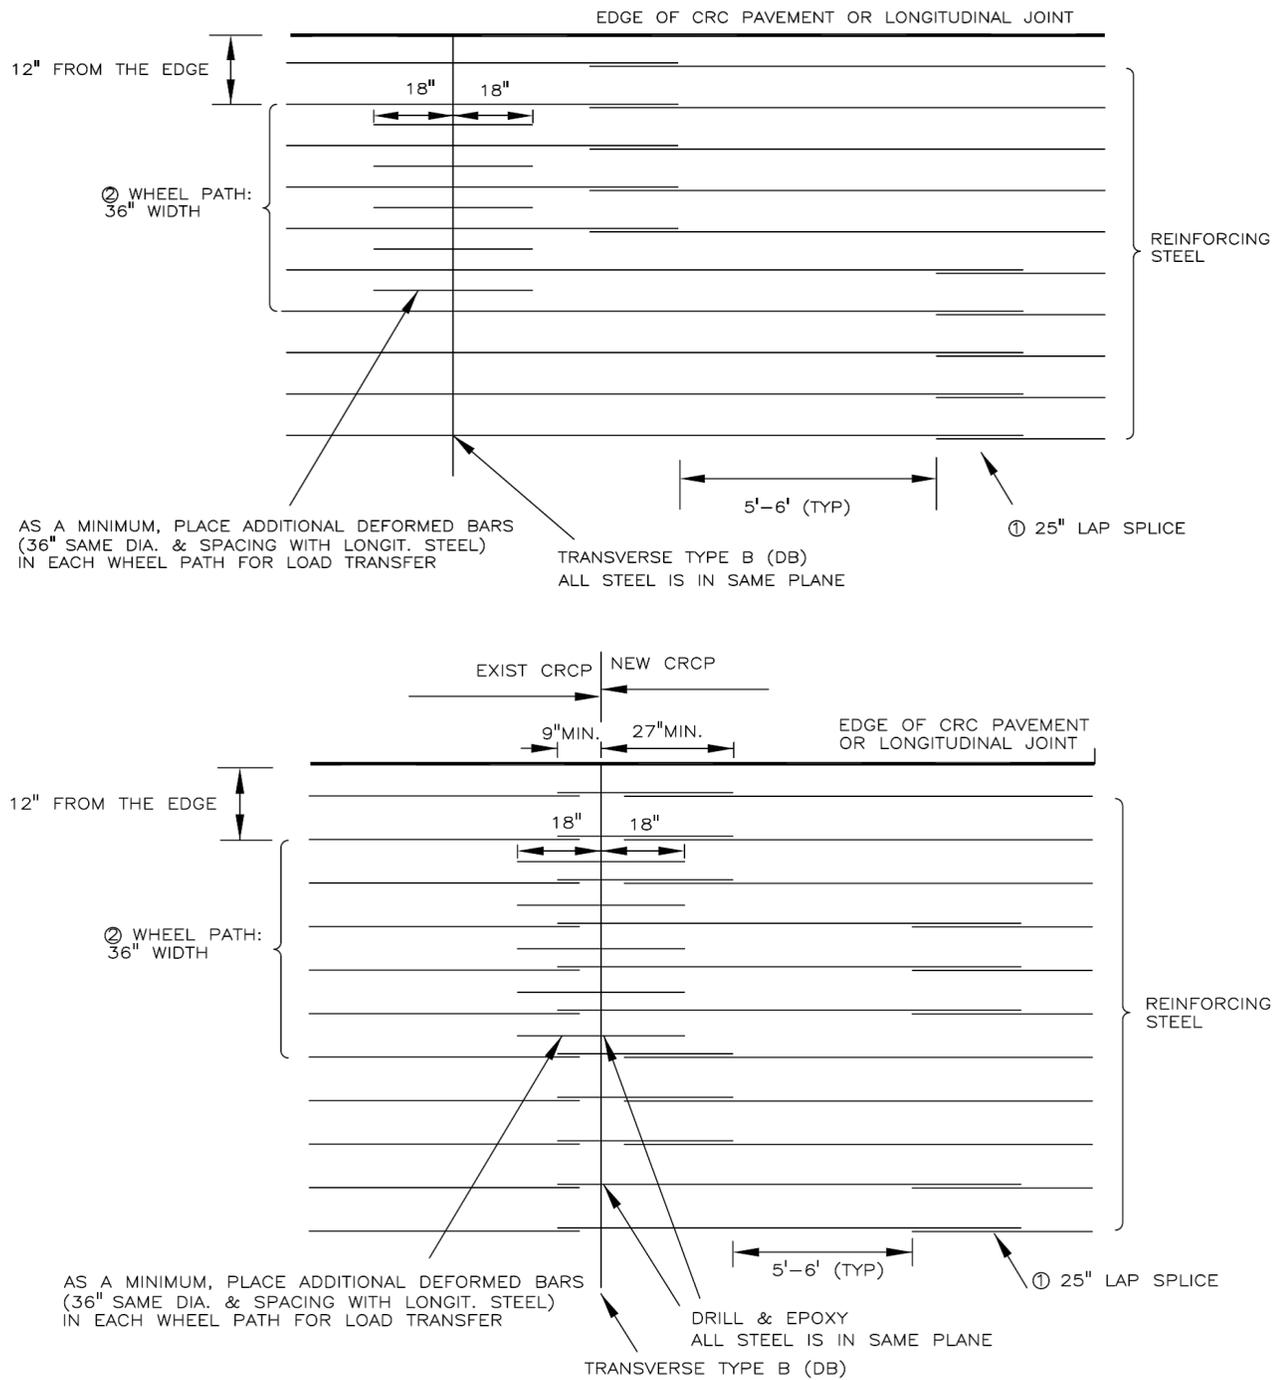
Wheel-path reinforcing details of a CRC pavement construction joint. (1 inch = 25.4 mm; 1 ft = 0.305 m)
